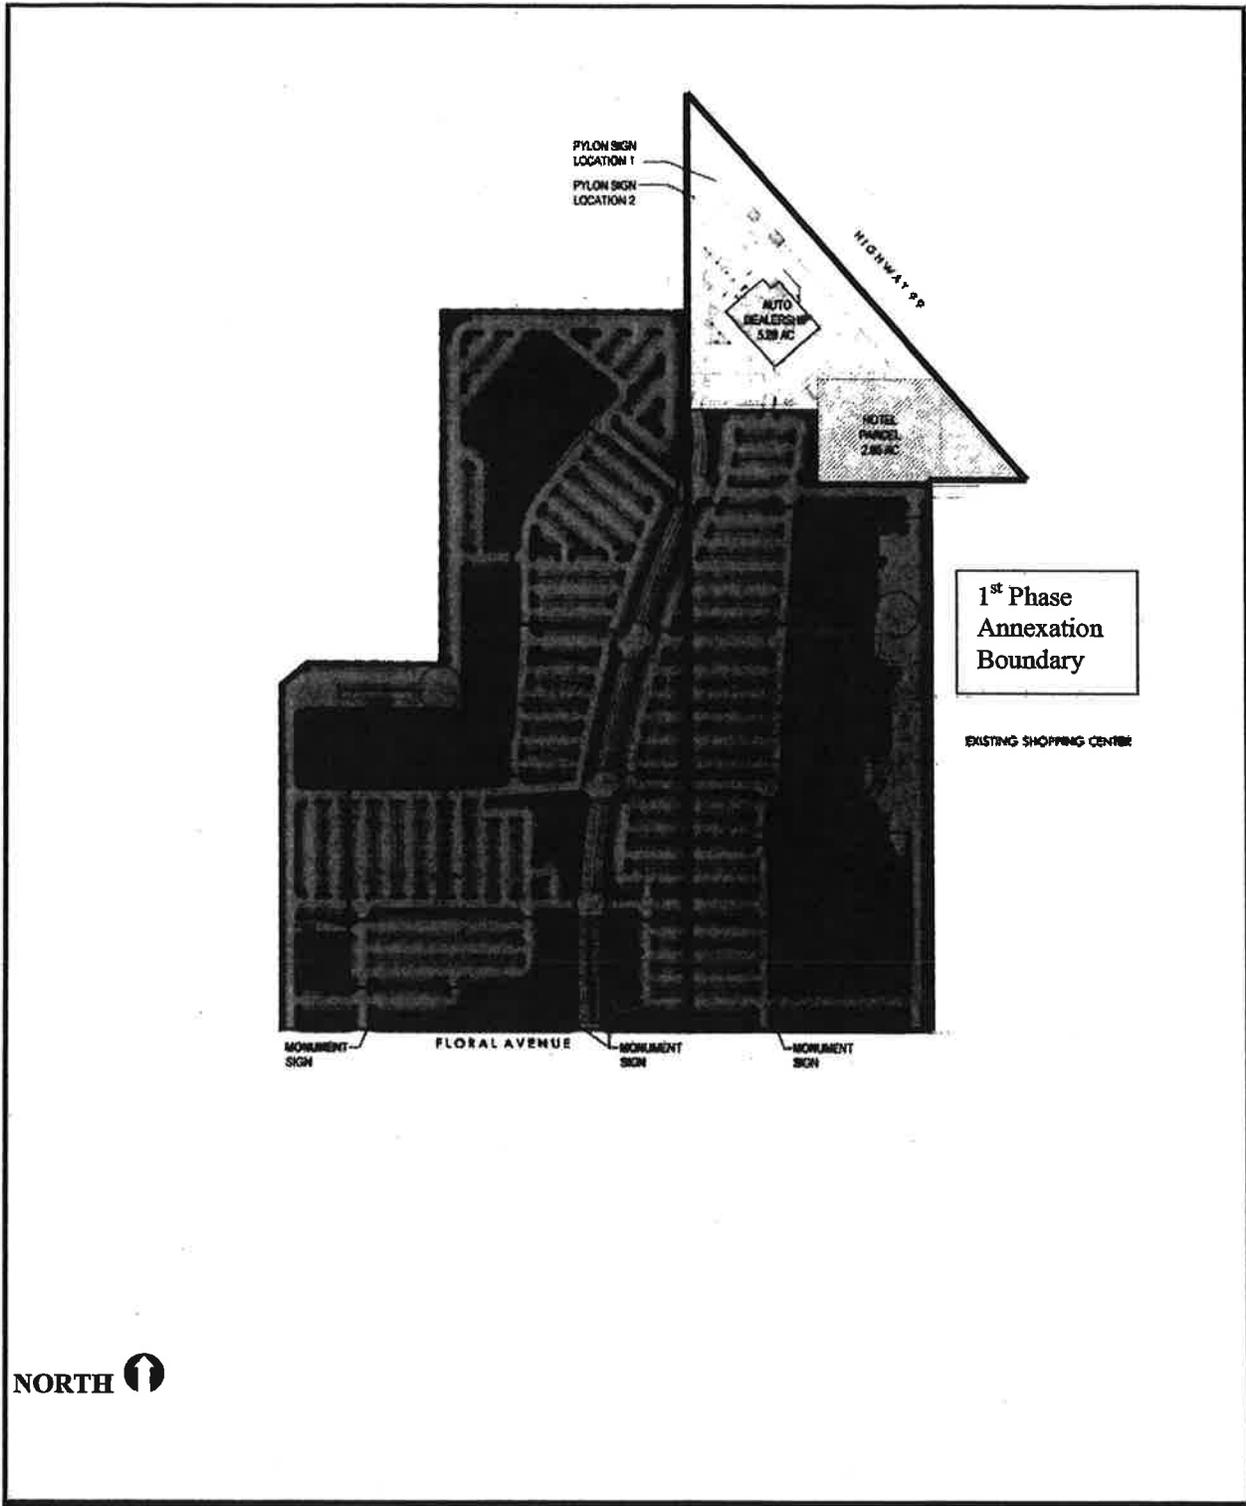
REVISED SELMA GROVE SITE PLAN AND PROPOSED PHASE 1 ANNEXATION PROJECT
